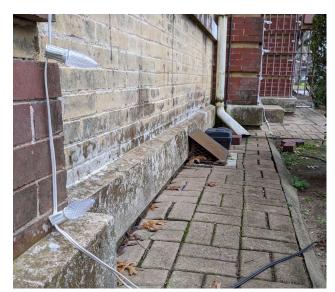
Existing brick pavers and covered crawlspace ventilation. Perimeter of building will receive 2' wide concrete mow strip.
